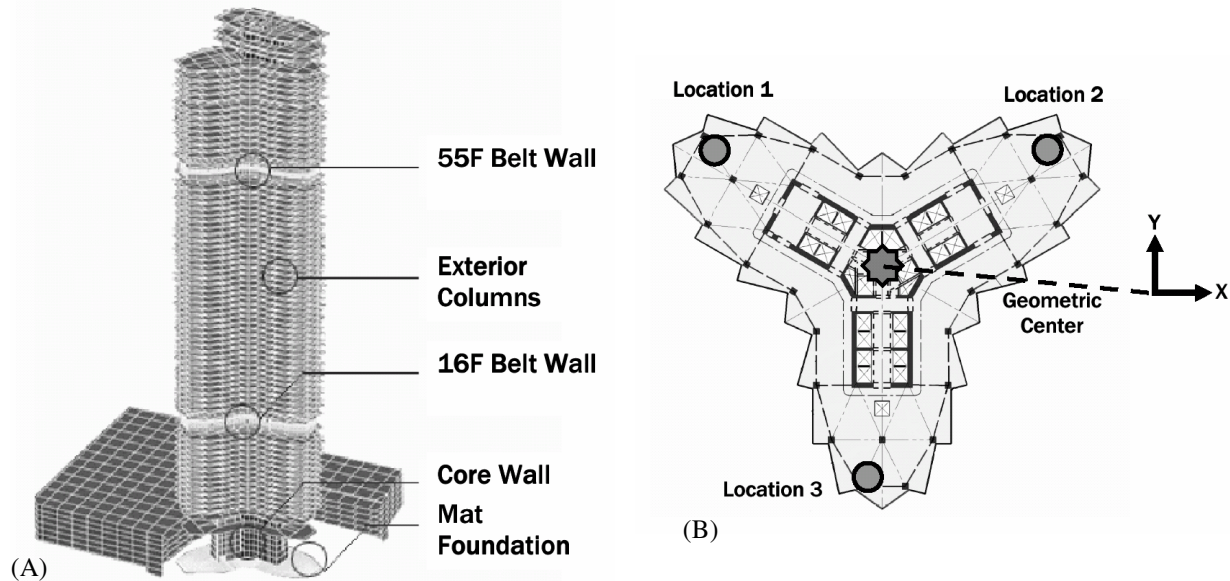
BUILDING DIAGRAMS: (A) ELEVATION VIEW WITH STRUCTURAL FEATURES; AND (B) 64TH FLOOR PLAN SHOWING INSTRUMENTATION LOCATIONS AND GLOBAL SWAY AXES
